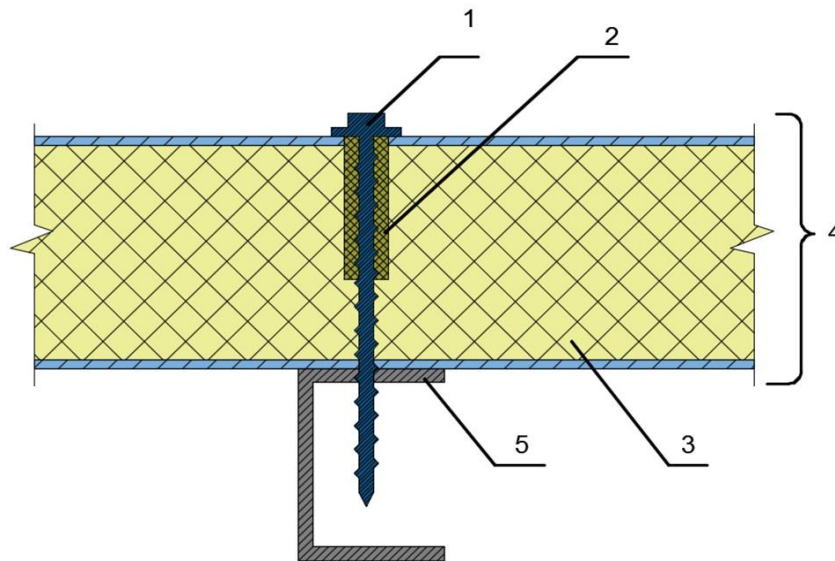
The alternative to thermal insulation at connection location of a sandwich panel to frame: 1 – screw, 2 – thermal insulation tube, 3 – sandwich panel core, 4 – sandwich panel, 5 – frame element
